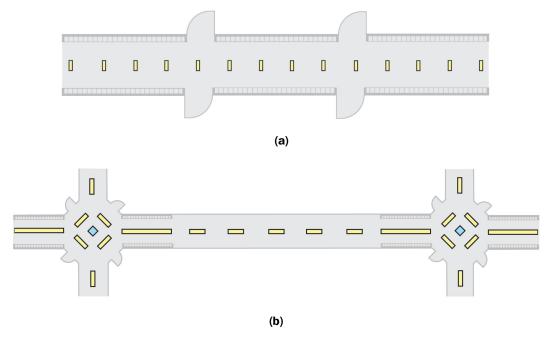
(EL26) (a) Corridor layout 1 and (b) corridor layout 2.
